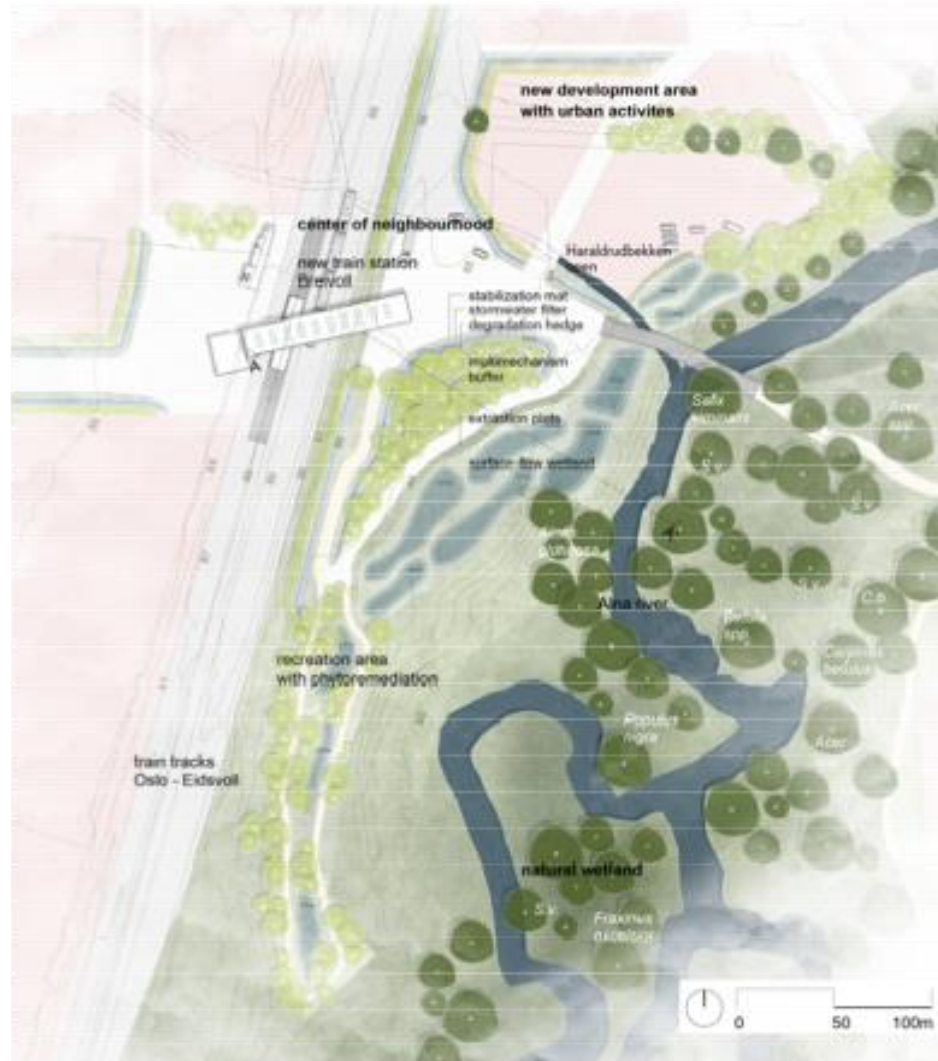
SITEPLAN A PHASE 03 - IMPLEMENTATION OF CITY'S DEVELOPMENT PLAN
